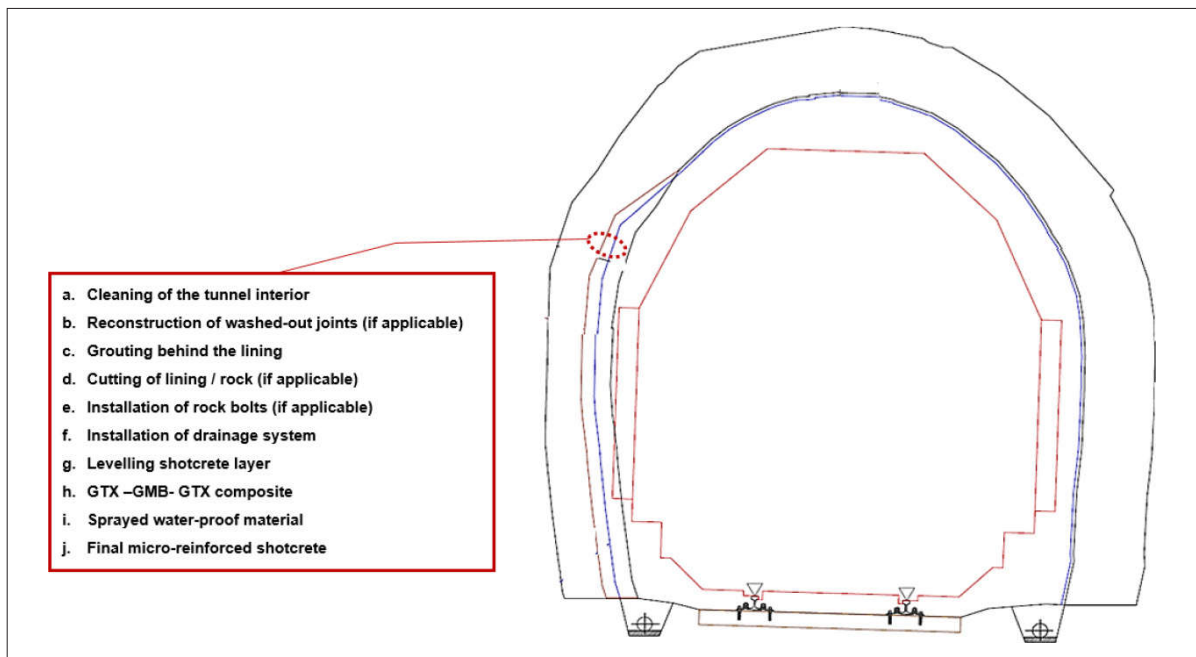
A typical railway tunnel cross section with rehabilitation measures
